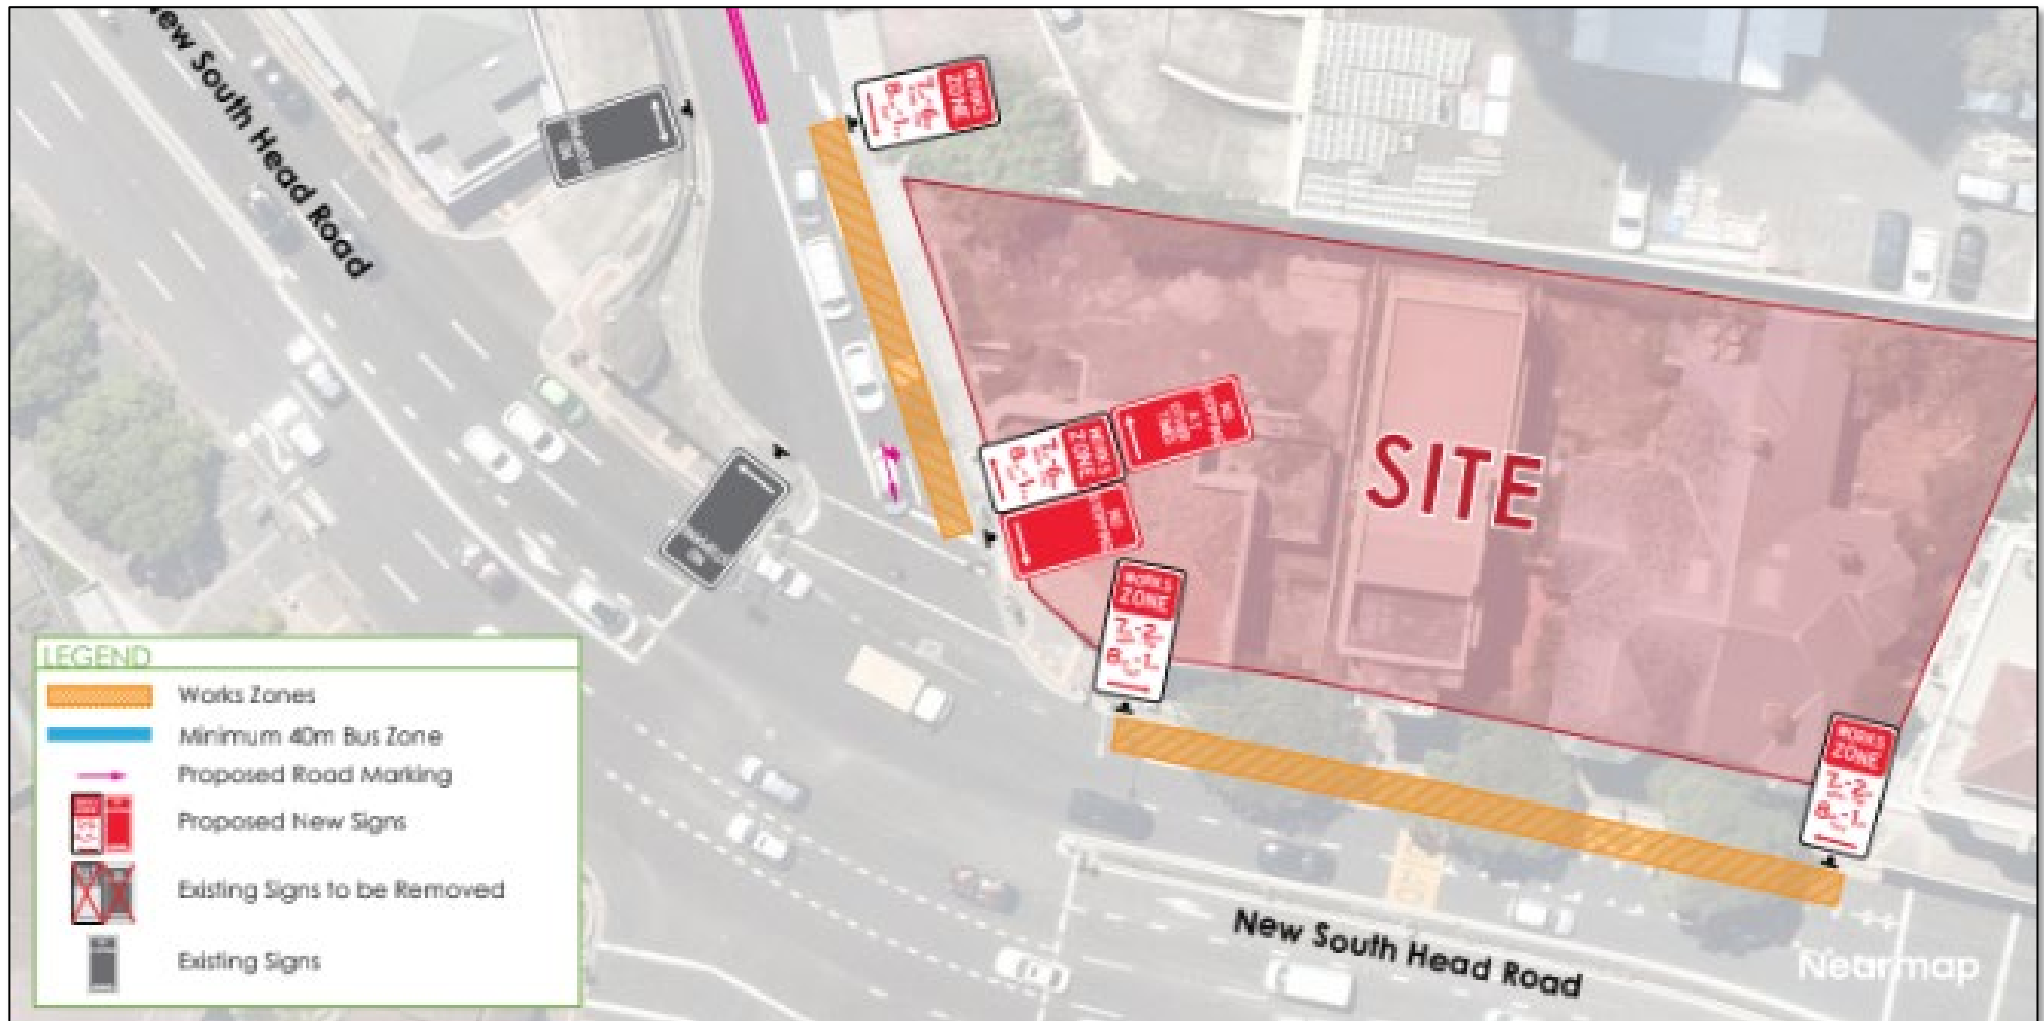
Site plan showing 45m works/hoisting zone on New South Head Road.
